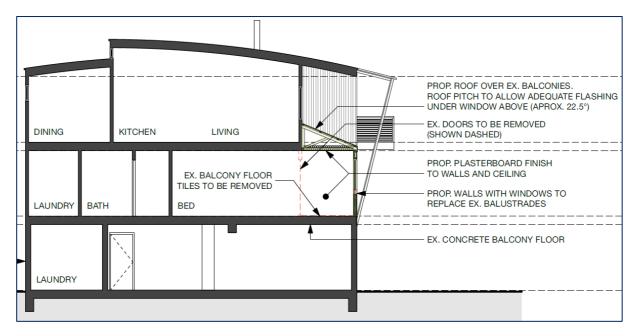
| Cross section of typical works (Source: Applicant's documentation)
